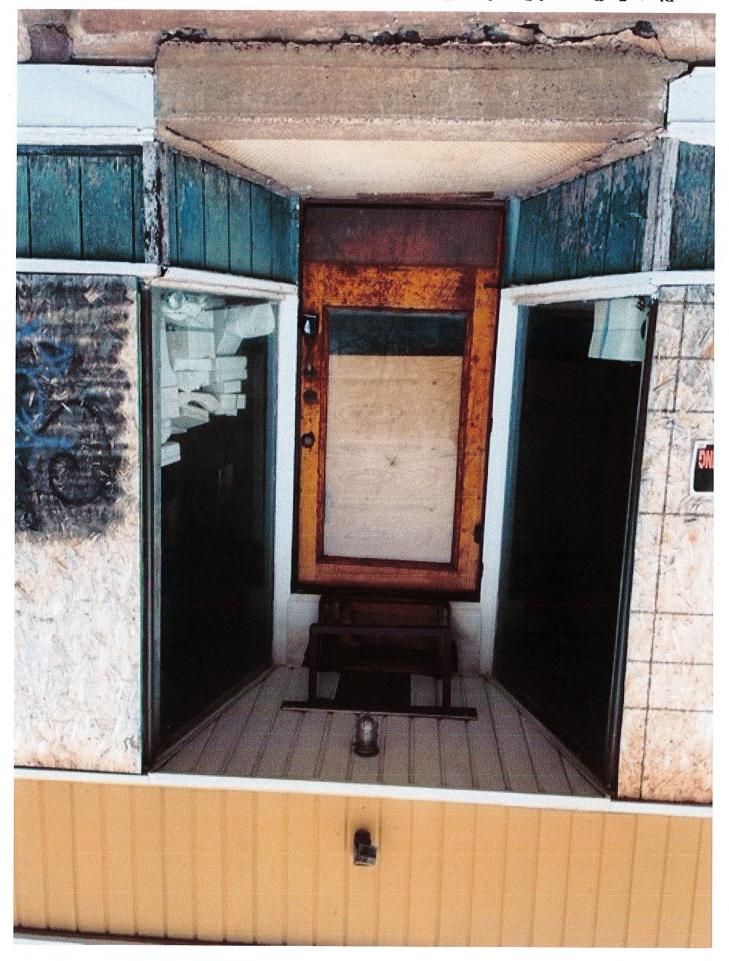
Recessed Storefront Entry Showing Original Configuration / Front Door
